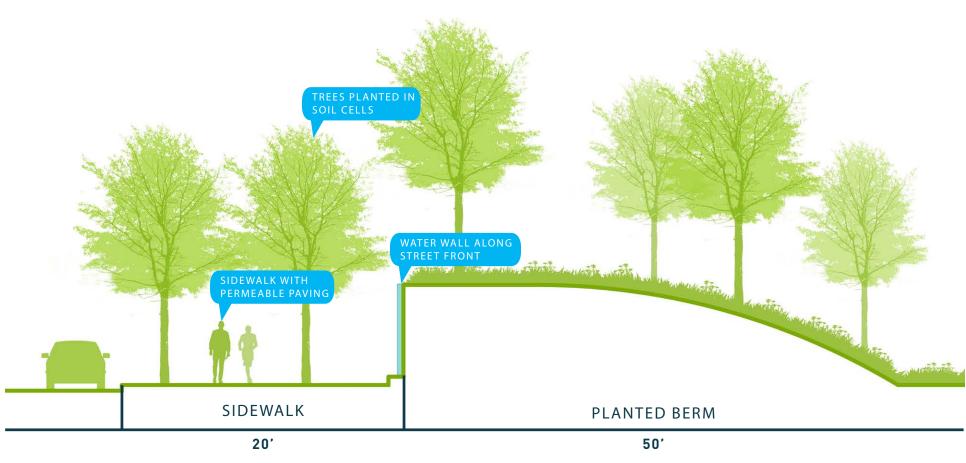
A section through International Boulevard at the border crossing illustrating a planted berm and water wall facing the street.
